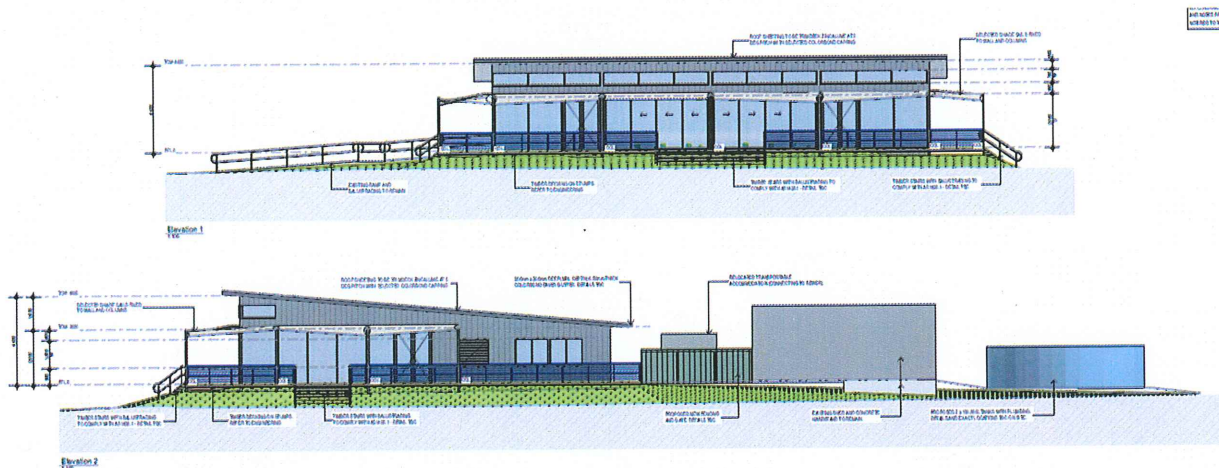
Elevations of proposed pavilion at Kings Meadow depicting building elements
